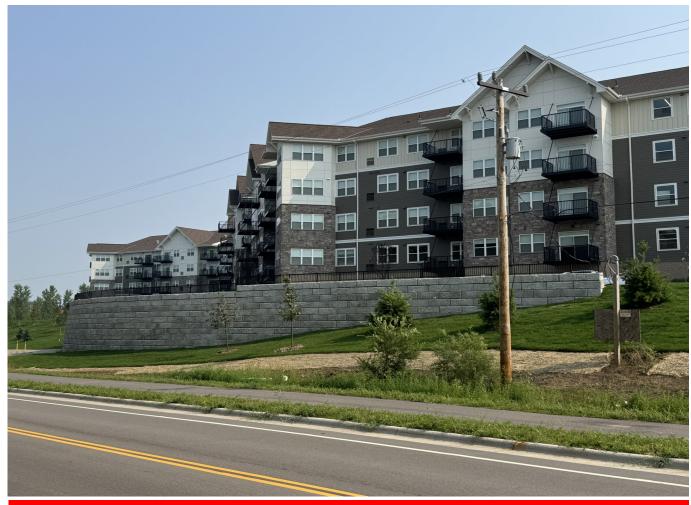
Reinforced Soil Wall Enhancing Site Stability and Aesthetics
